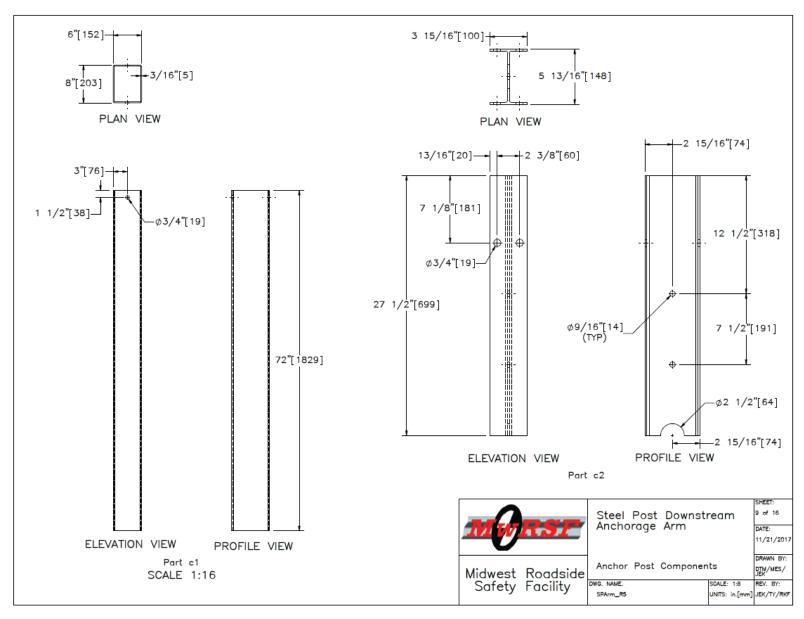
T-Shaped, Breaker Bar Design – Anchor Post Components
